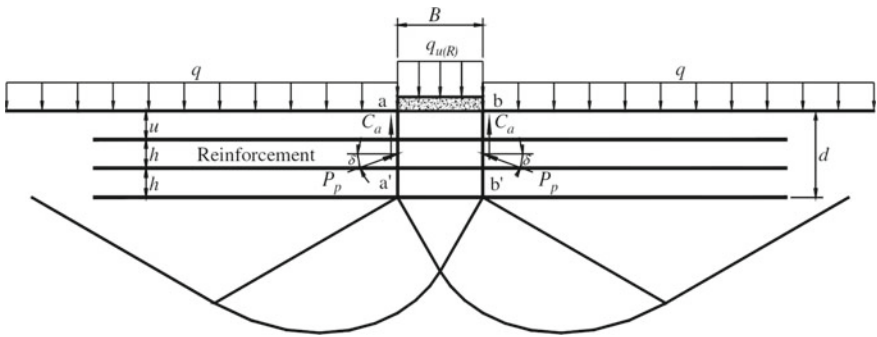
Failure similar to footings on a two-layered soil (Wayne et al. 1998)
